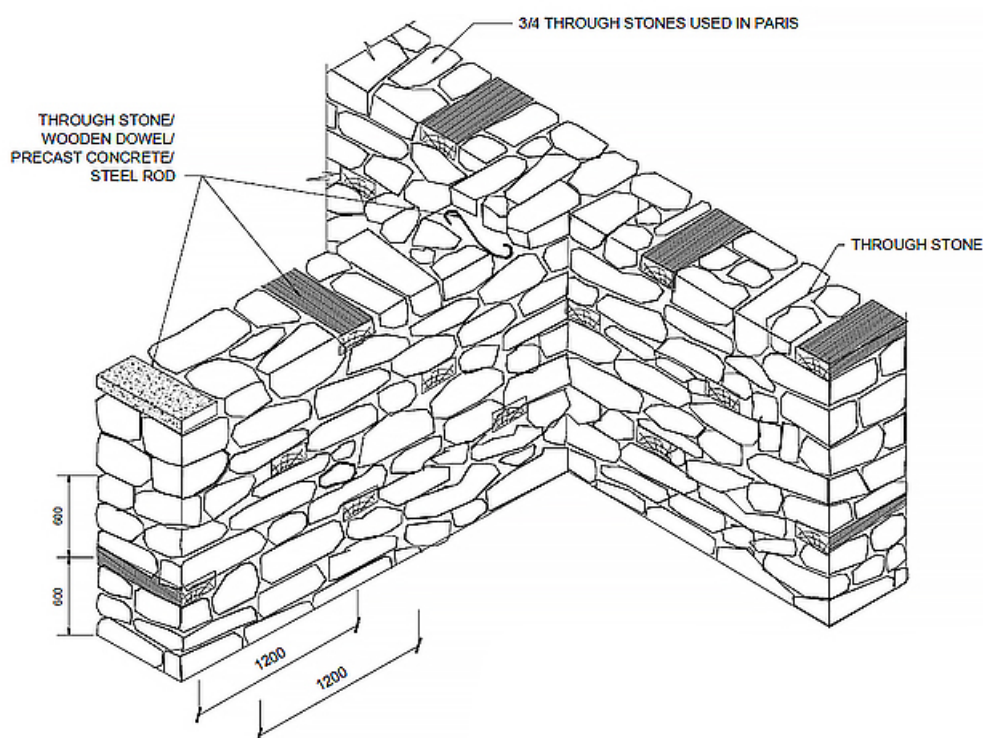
Random Rubble Masonry with 'Through' stones or other Bonding elements
